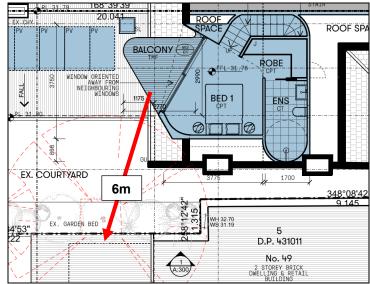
Sightlines from proposed terrace to No. 49 Darling Street
